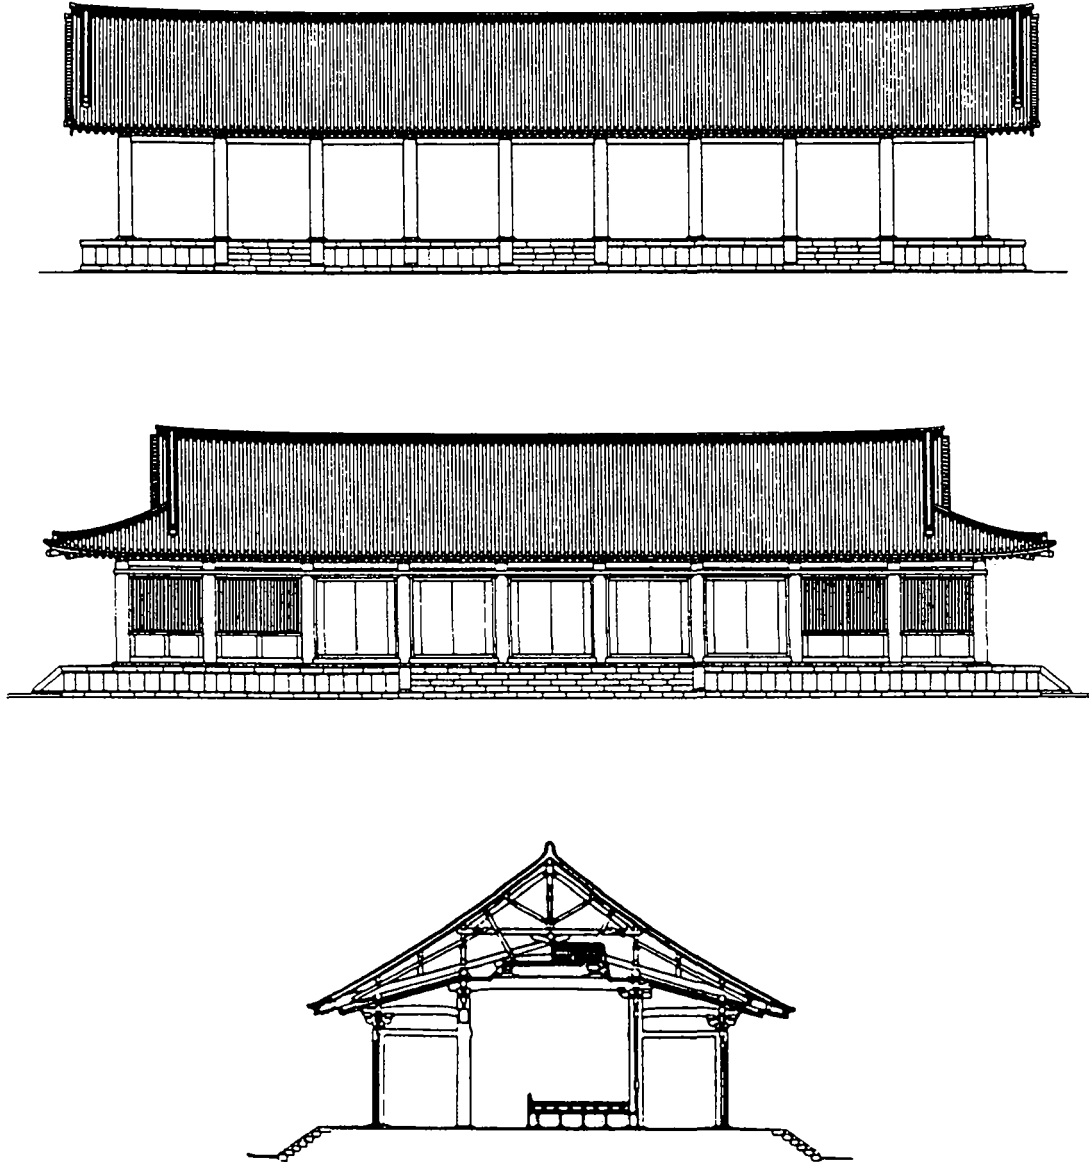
Reconstructed original front elevation, front elevation of the first reconstruction and extant section (with 'hidden roof') of the *kōdō* 講堂 こうどう 강당 of Tōshōdai-ji 唐招提寺とうしゅうだいじ 당초계사 (Nara period and later reconstructions, scale: 1 : 300) (after: ASAI Kazuharu 浅井和春あさいかずはる 천정 화춘 (1990), p. 86; NAKAGAWA Takeshi 中川武なかがわたくし 증천무 (1990), p. 165)
